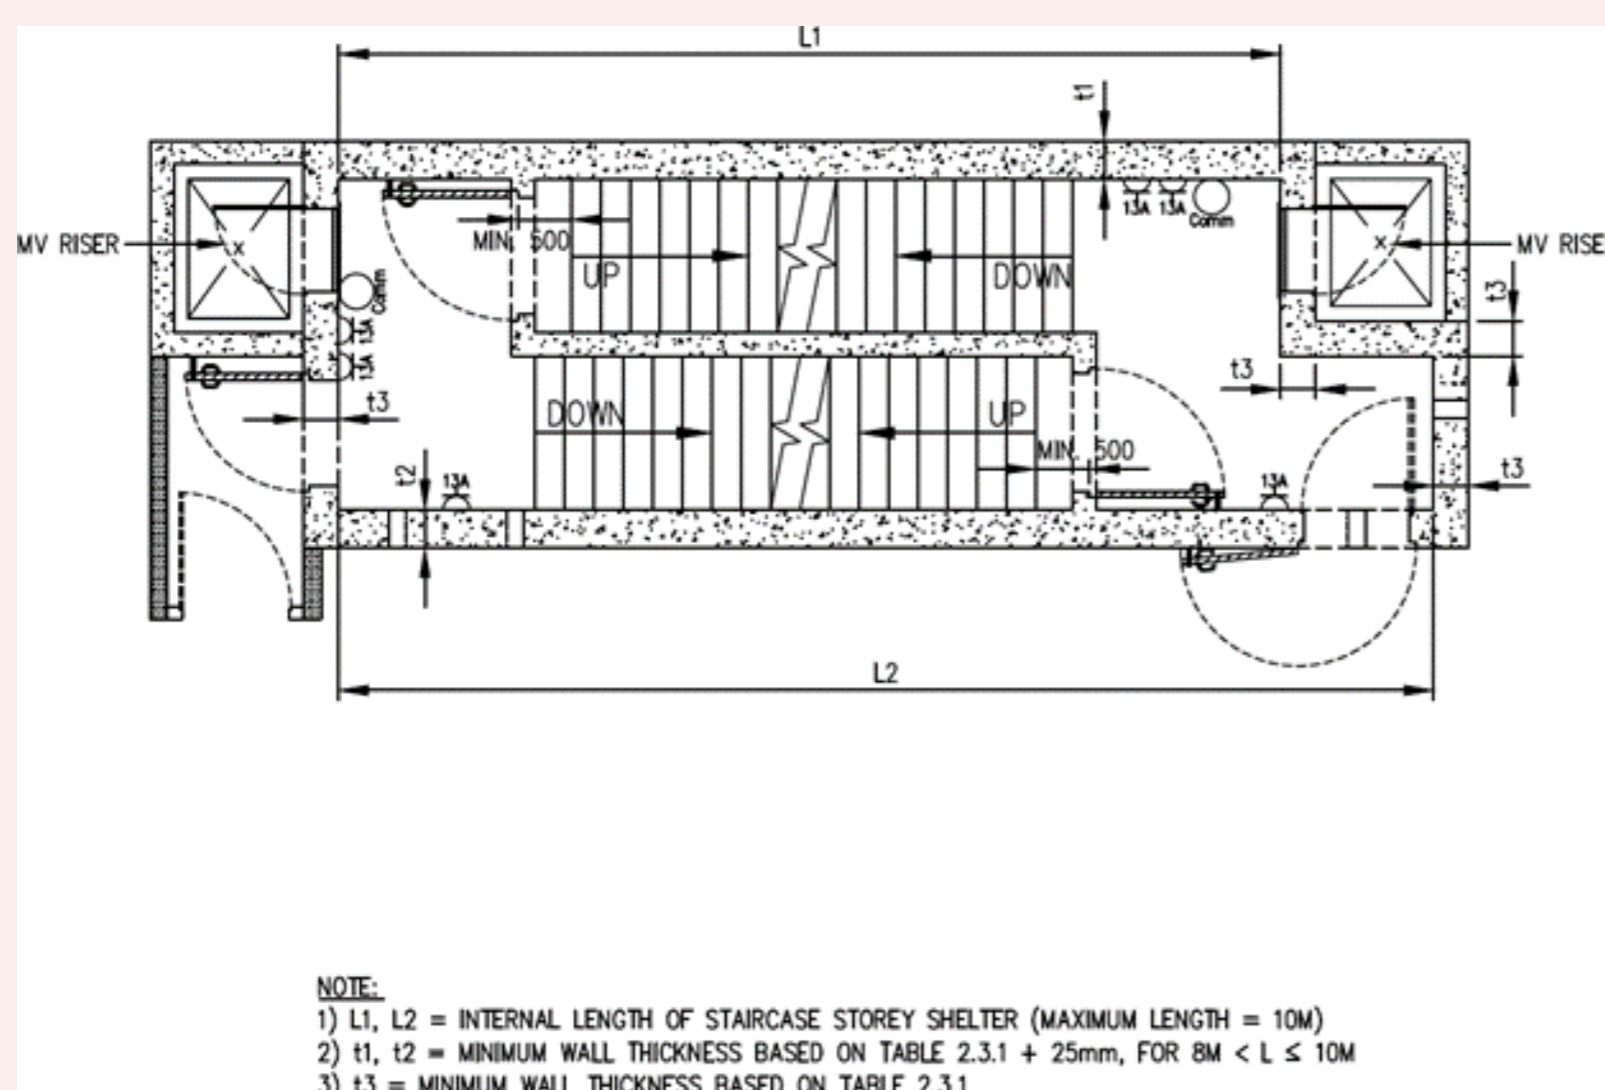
(b): TYPICAL LAYOUT OF S/C SS
